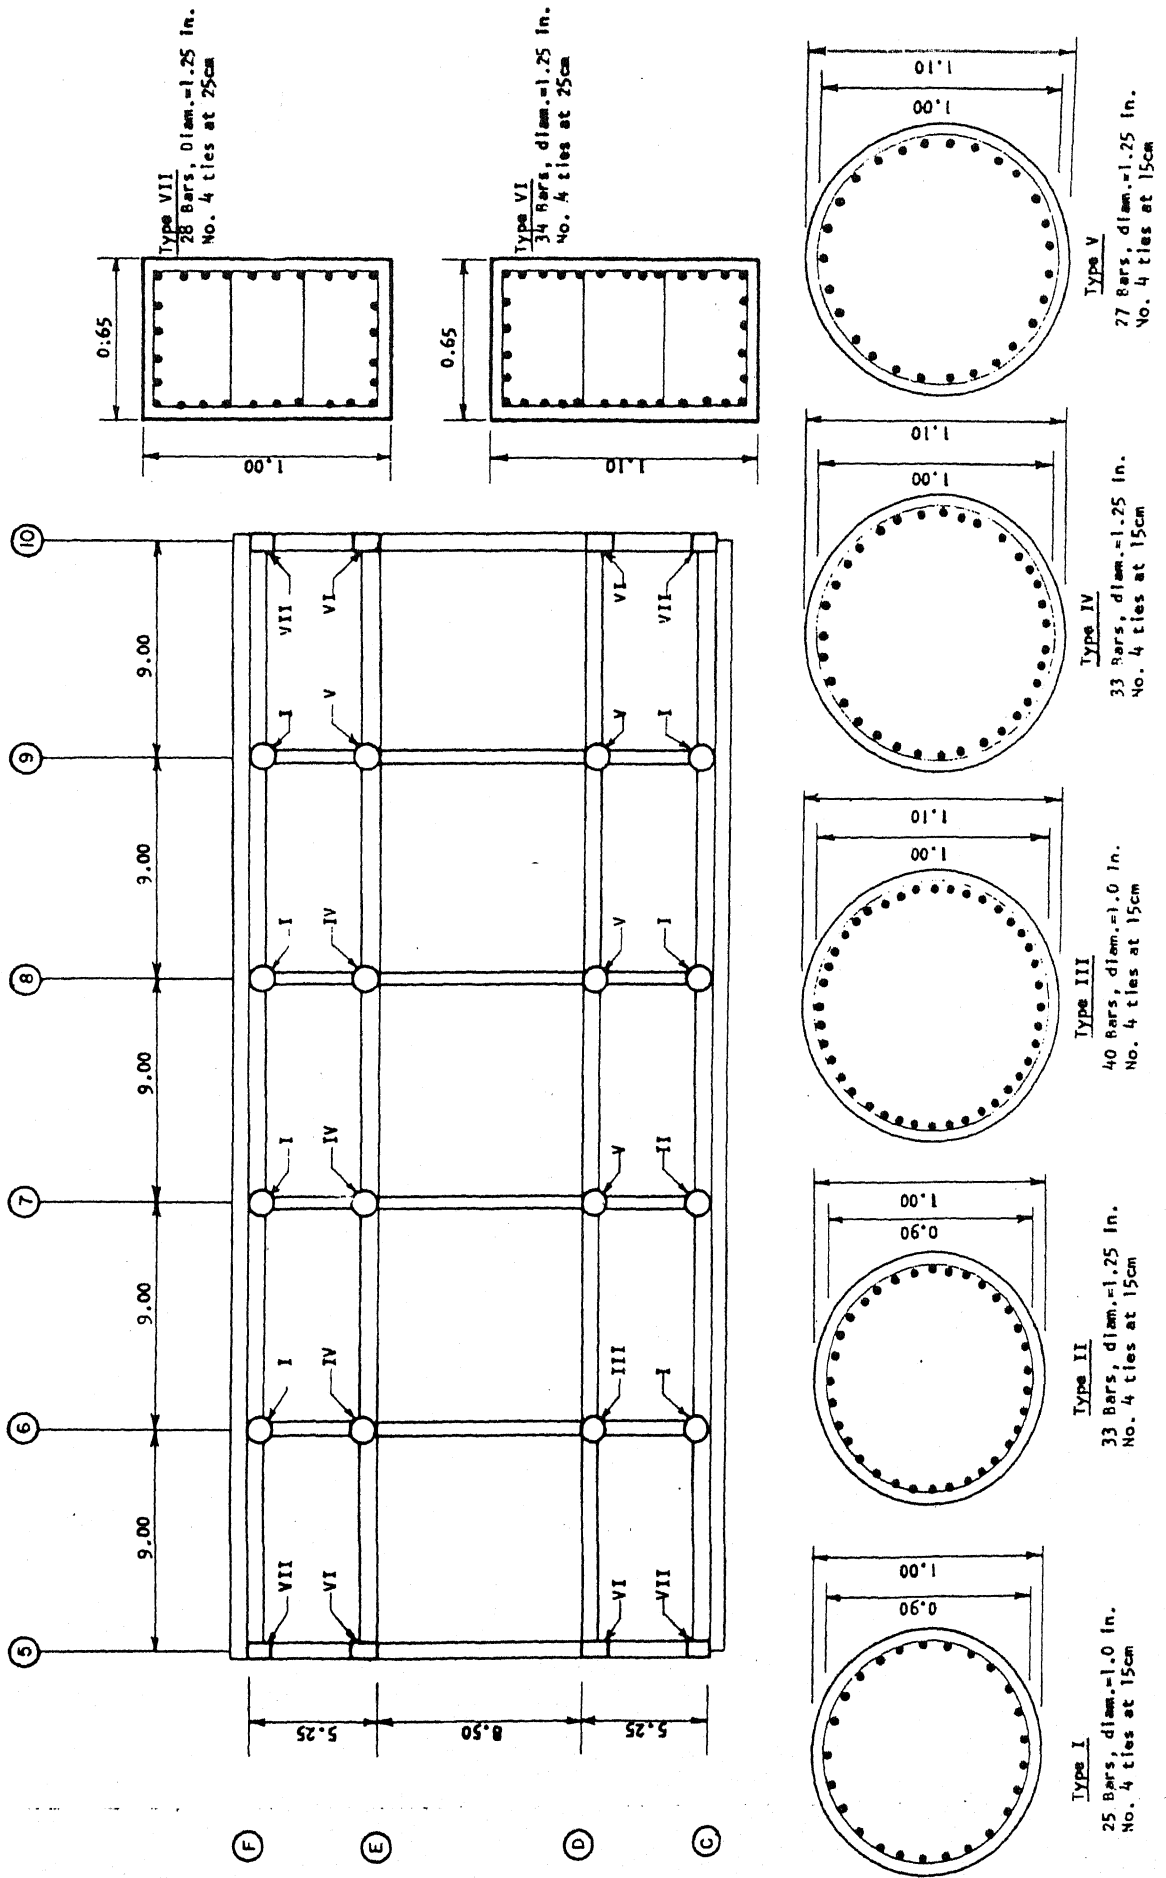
PLAN OF THE CENTRAL PORTION, MAIN BUILDING, SHERATON-MACUTO
